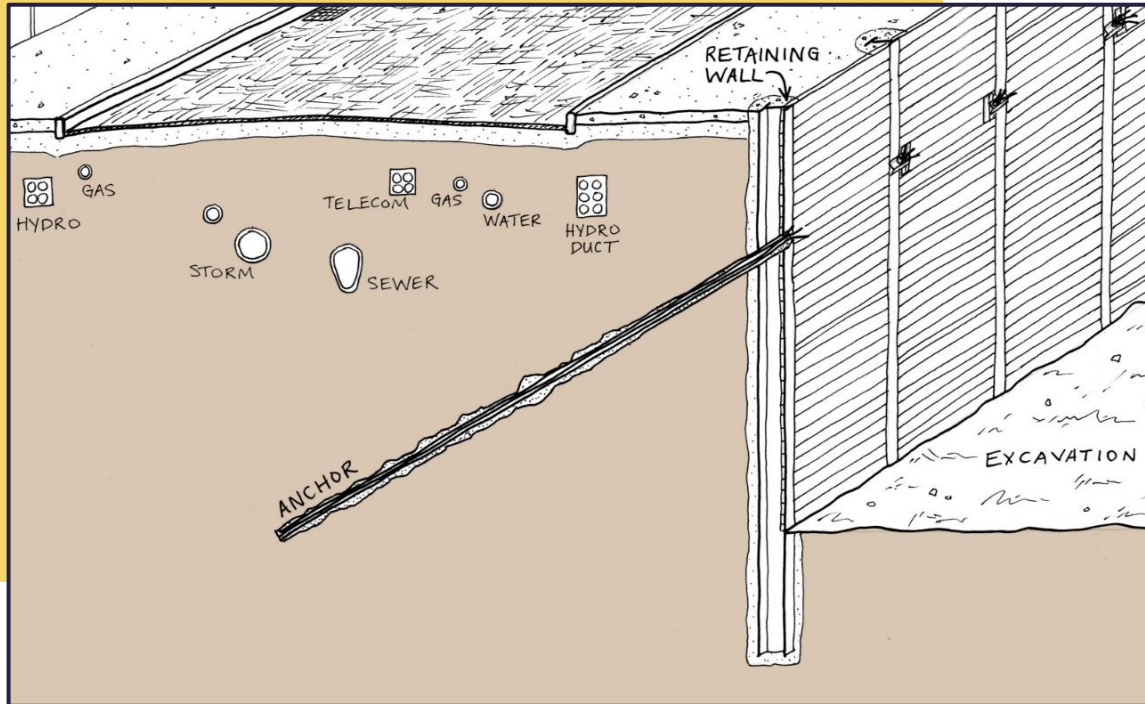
Diagram of an excavation supported with tiebacks next to a city street.
